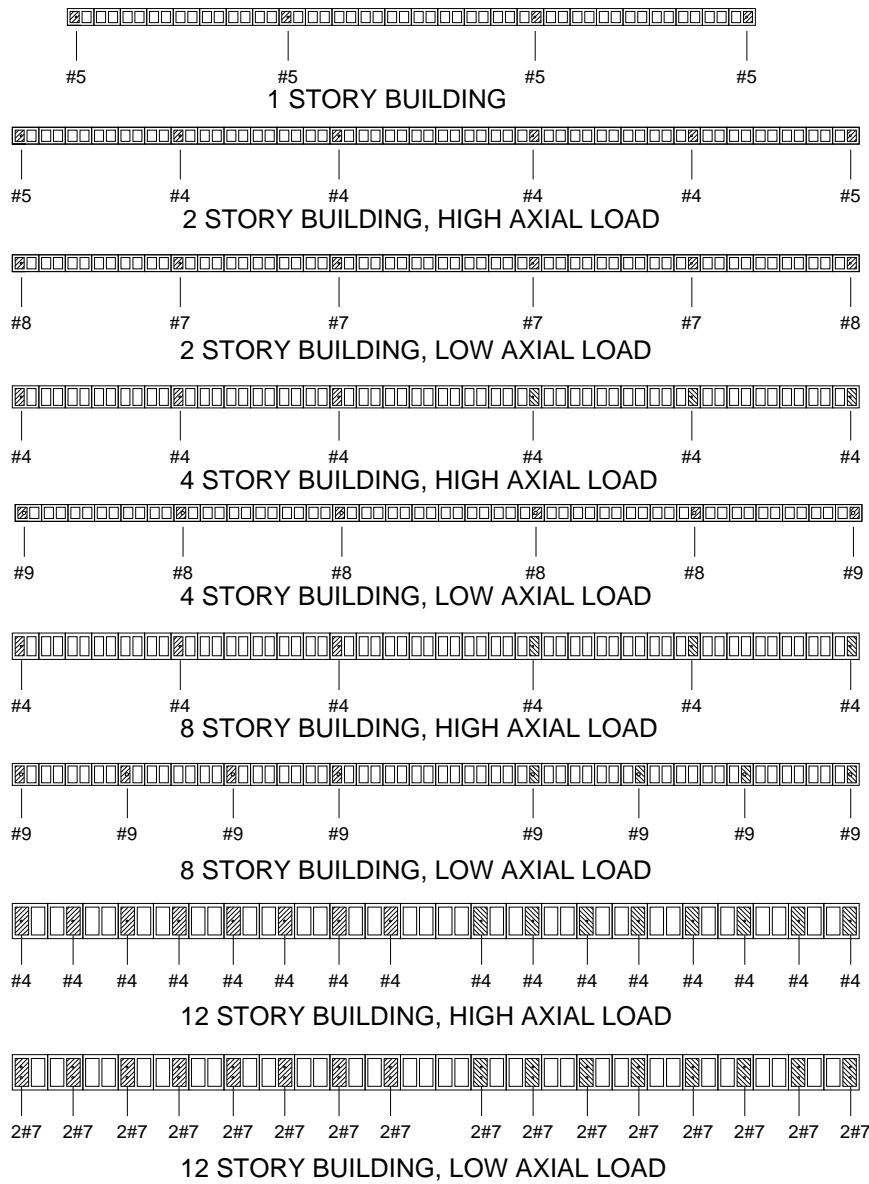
Plan sections of partially grouted ordinary reinforced masonry shear walls, SDC  $C_{max}$ .
